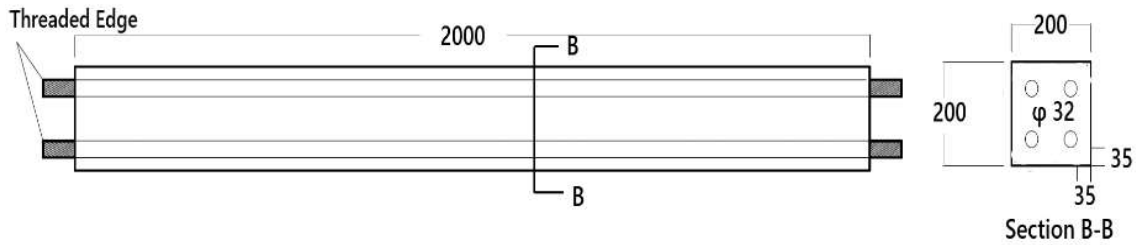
Details tensile specimen for crack spacing (Naotunna, Samarakoon and Fosså, 2020)
